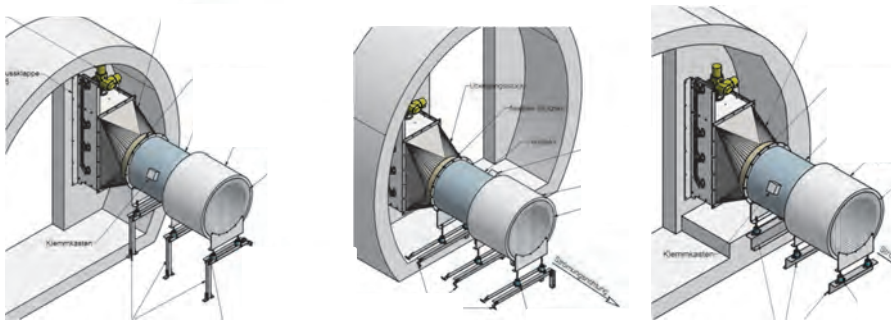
Three different arrangements of the damper, the drive and the fan at the end of the escape way which has access to the outside
